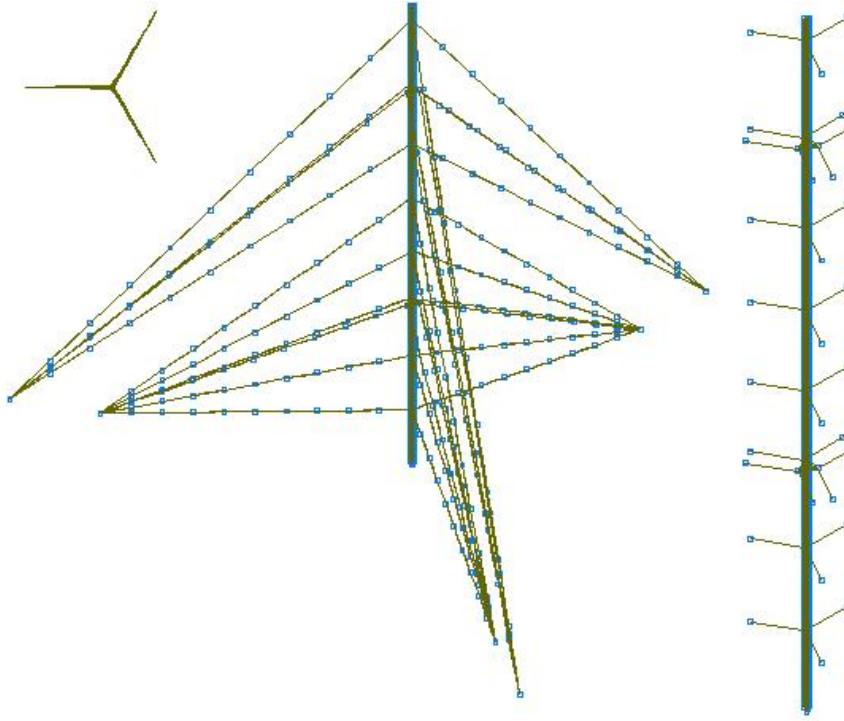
The detailed (left) and simplified (right) geometric layouts of the 152 m mast models .
